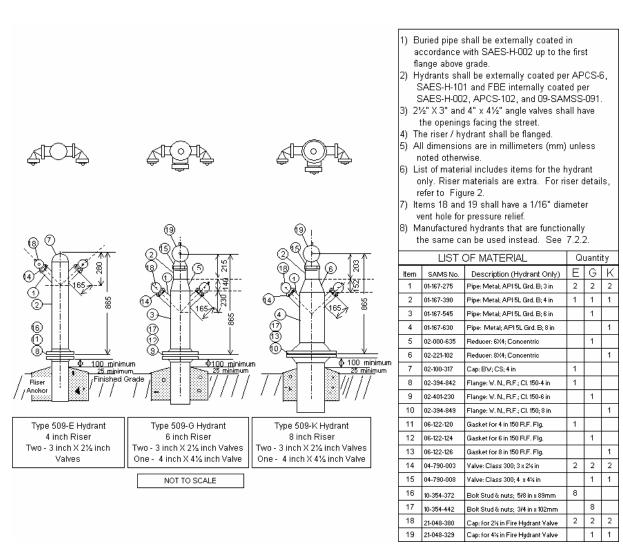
Welded Steel Fire Hydrant, Details
